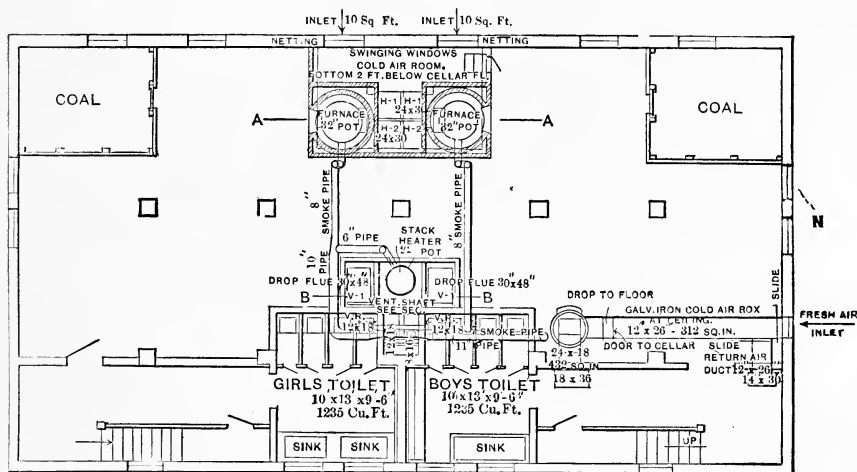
Basement Plan (9' 6") of School Building Heated by a Furnace System.
